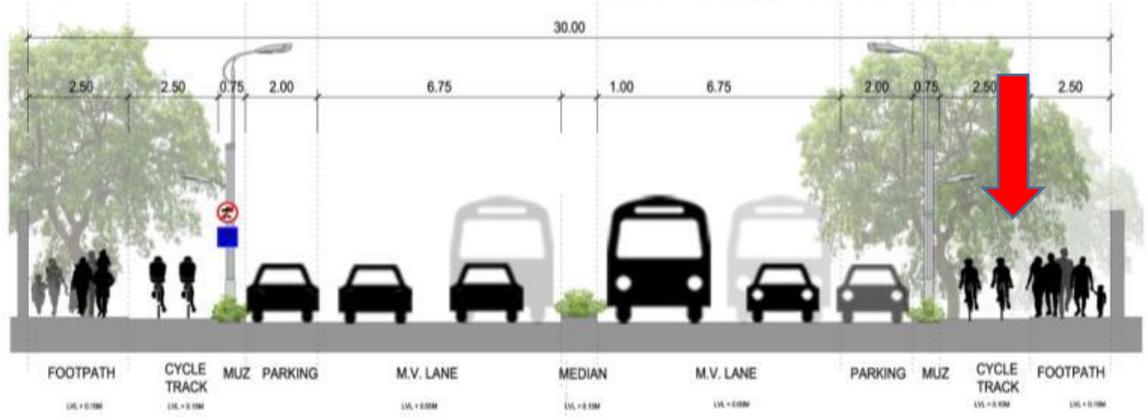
Proposed Typical Cross Section - Mahatma Gandhi Road
